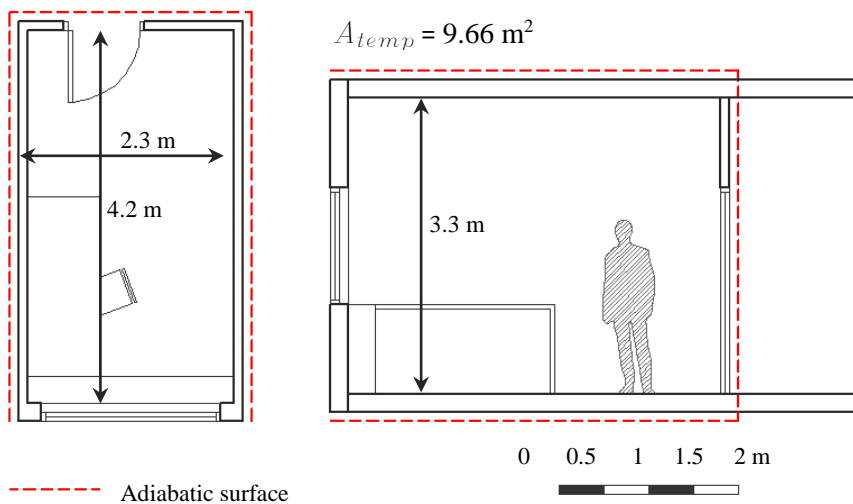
Plan (left) and section (right) of base case room. The red dashed line notes the surfaces that are not exposed to the outdoor conditions.
